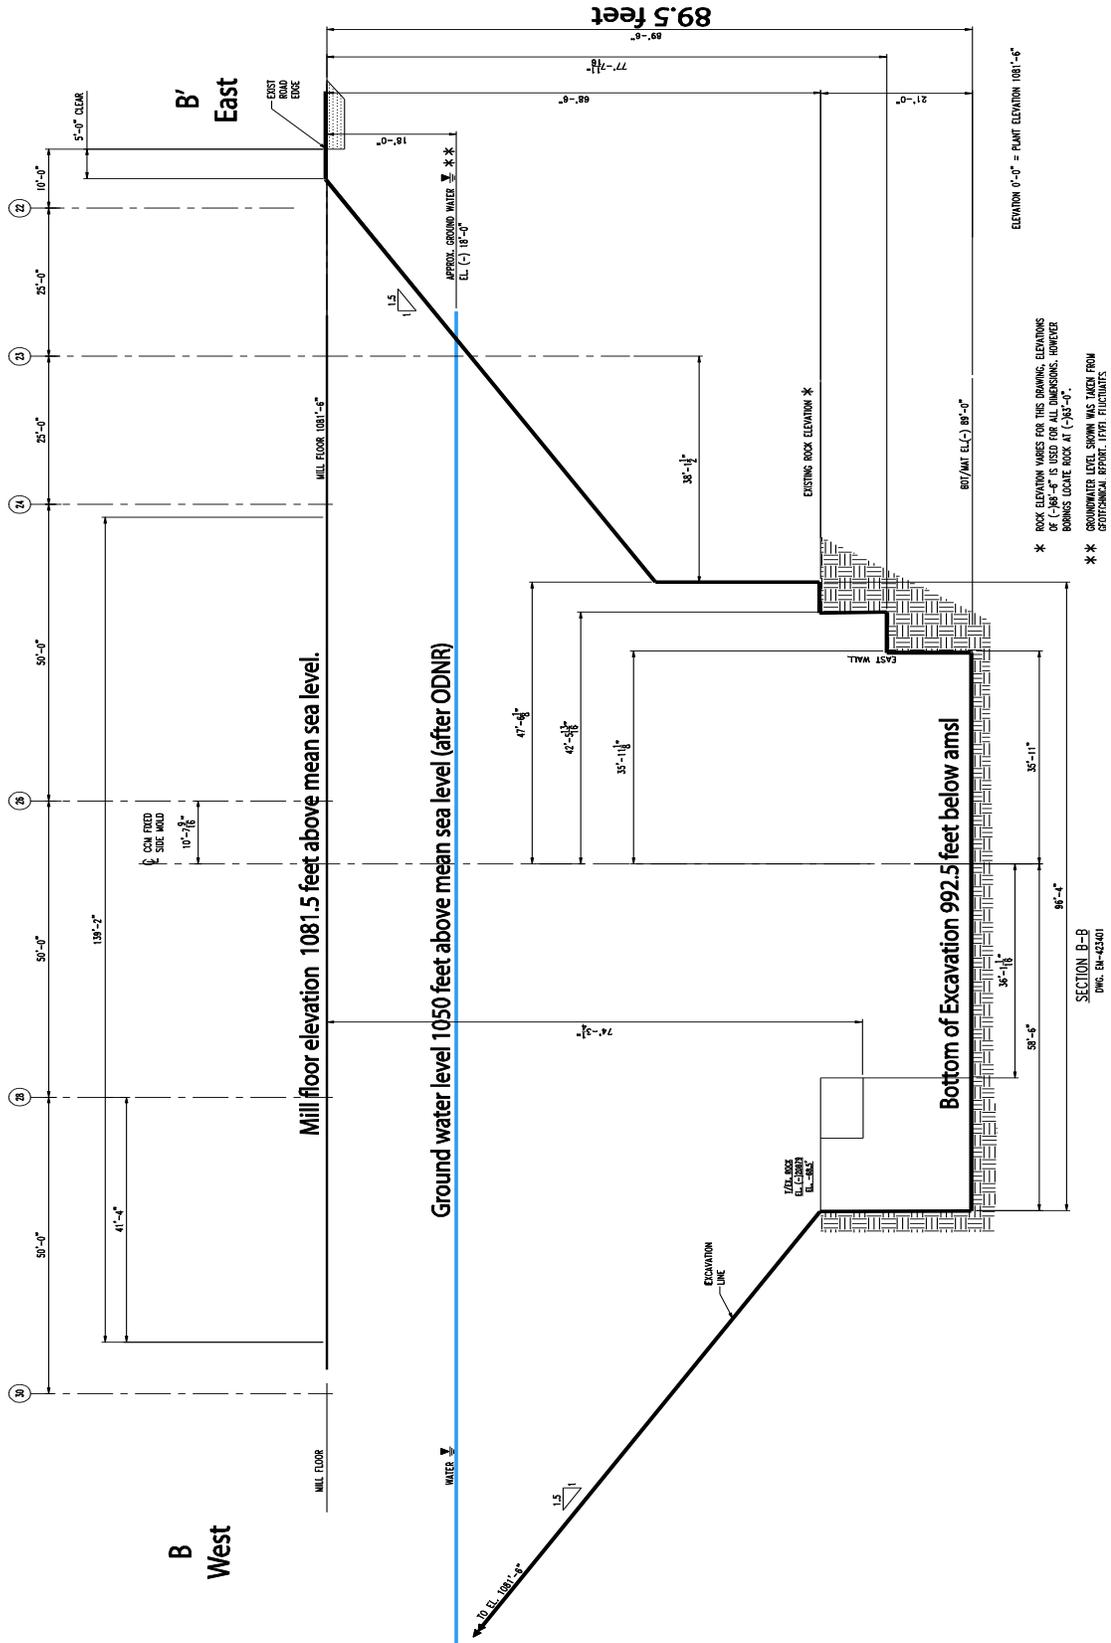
Cross Section B-B' Drawn West To East Through the Timken Construction Dewatering. Excavation (After Timken, modified by ODNR-DSWR, figure not to scale)
